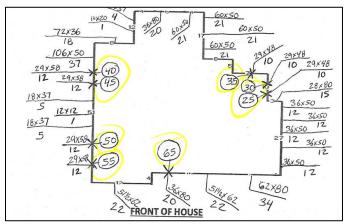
Site plan showing the front door (65) and seven windows to be replaced.
